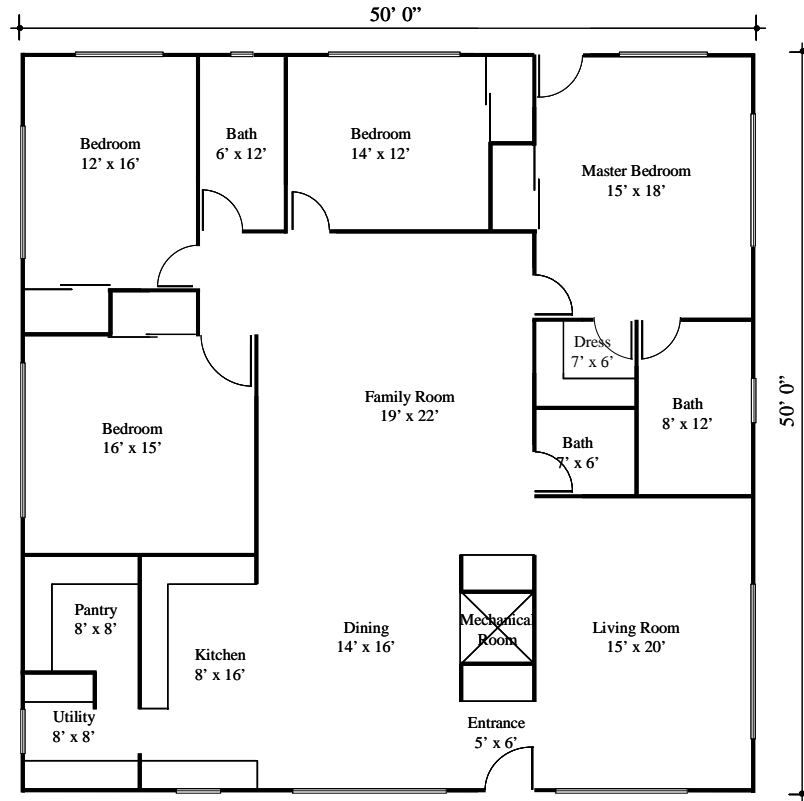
Interior Layout of the Basecase House (2,500 ft<sup>2</sup> Floor Area, 18% Window-to-Floor Area)
